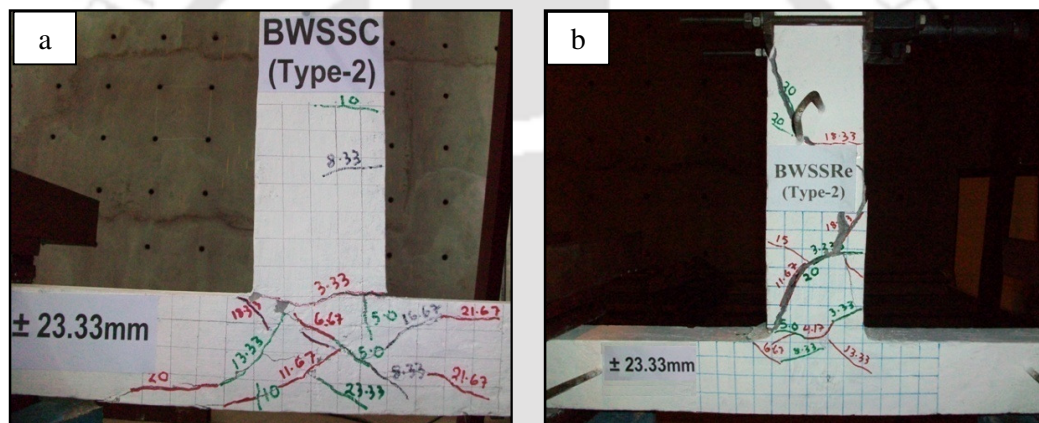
BWSS specimens at the end of test under loading type-2:
